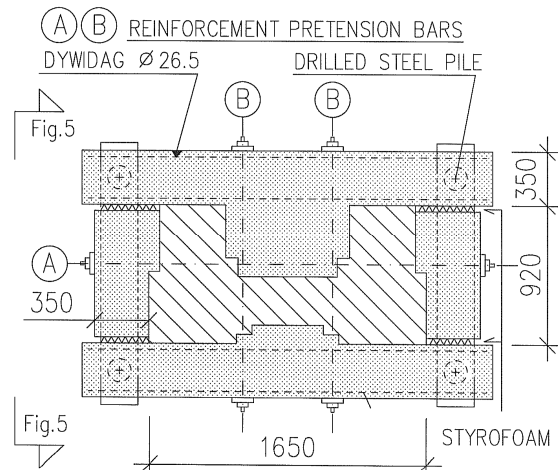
Eastern stair column, Pretensioned concrete mantel, Drilled steel piles
